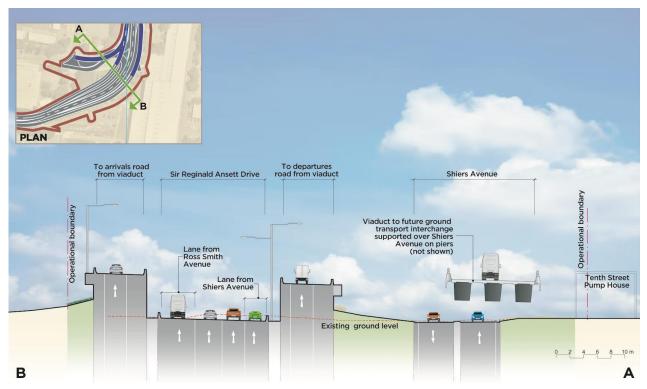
Terminals 2/3 access at ramp structure along Sir Reginald Ansett Drive north of Shiers Avenue – typical cross-section (looking south)
